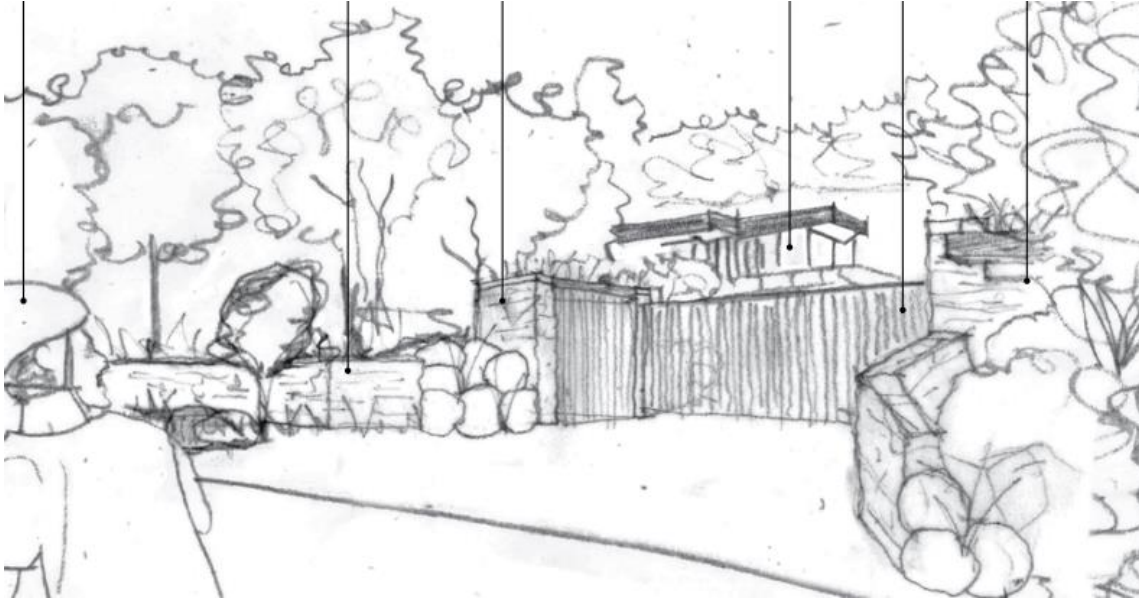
Sketch view from Hockley Lane looking back towards the application site
